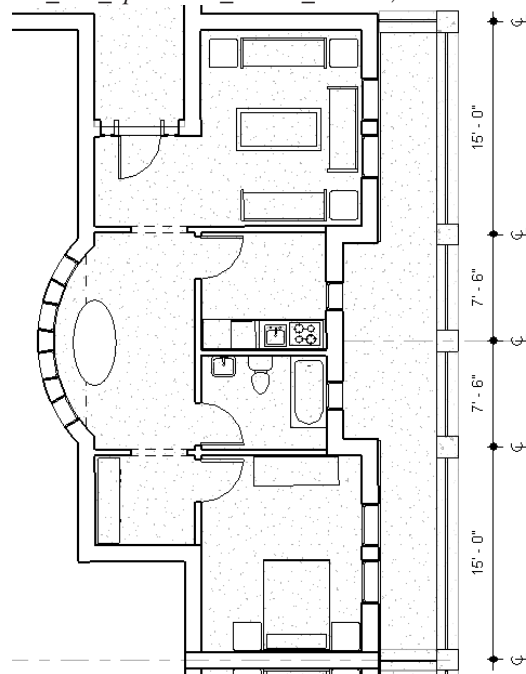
The sketch plan view for adding structural elements to the *Apartment 2* project
